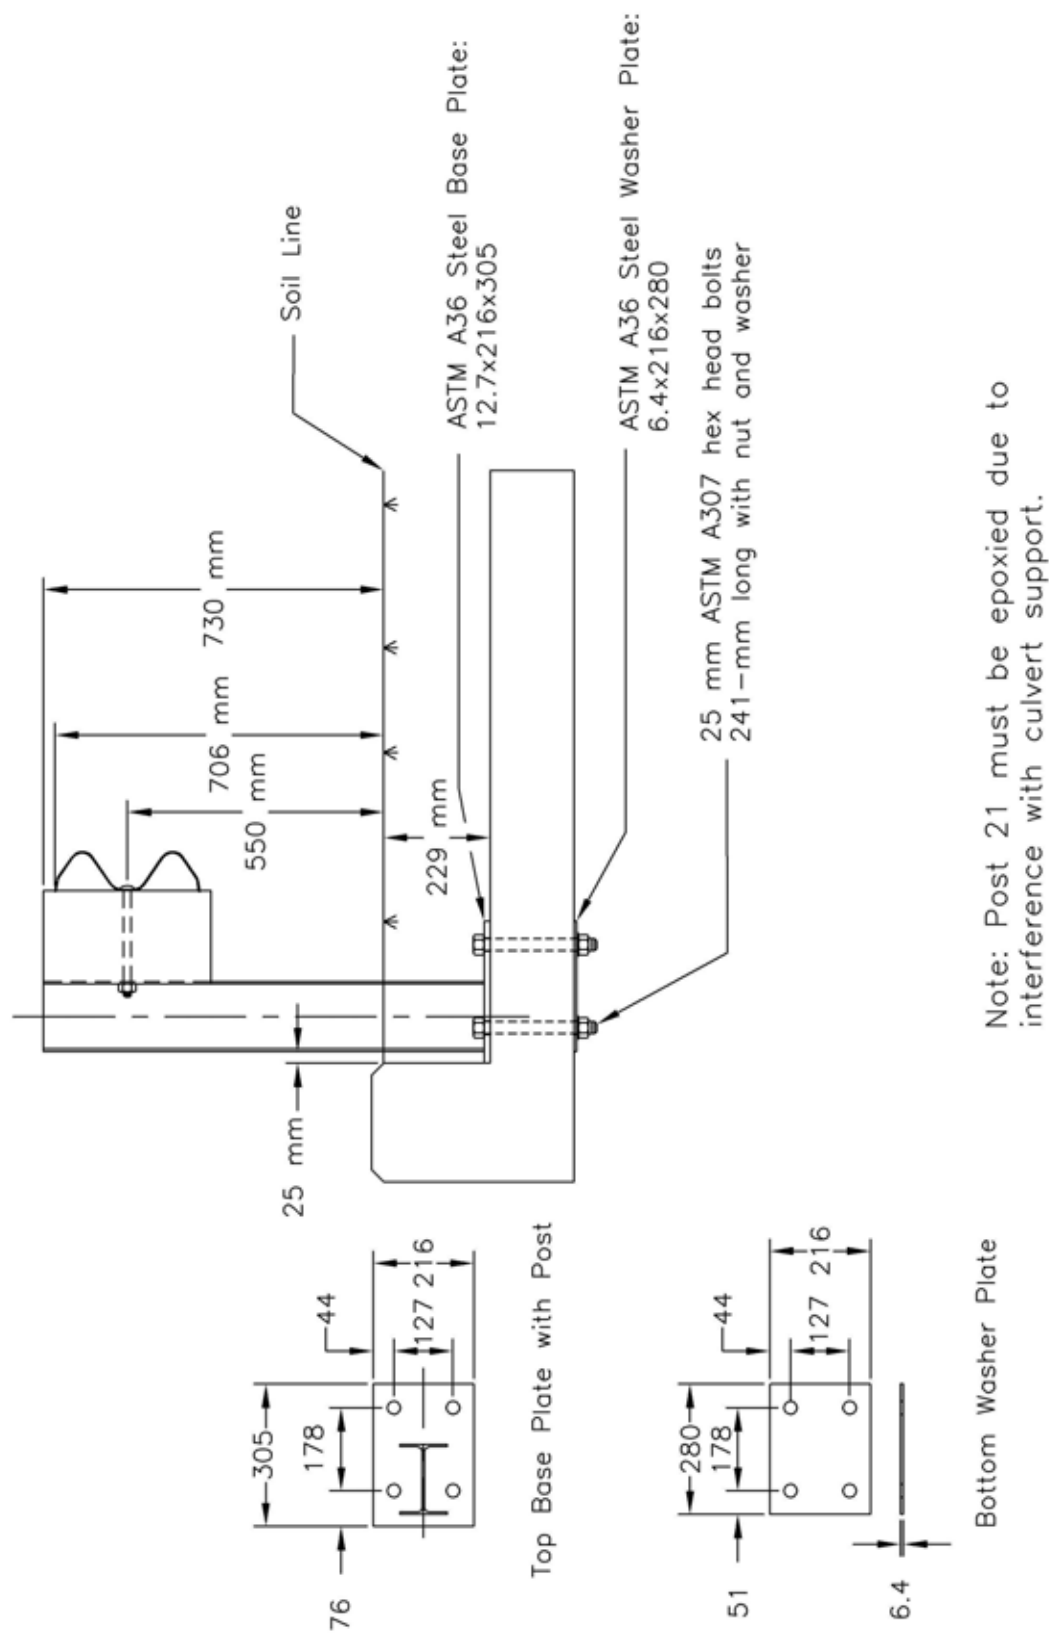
W-Beam Guardrail Attached to a Low-Fill Culvert Post Nos. 15 through 17, 21, and 23 through 27 (Option No. 2)
